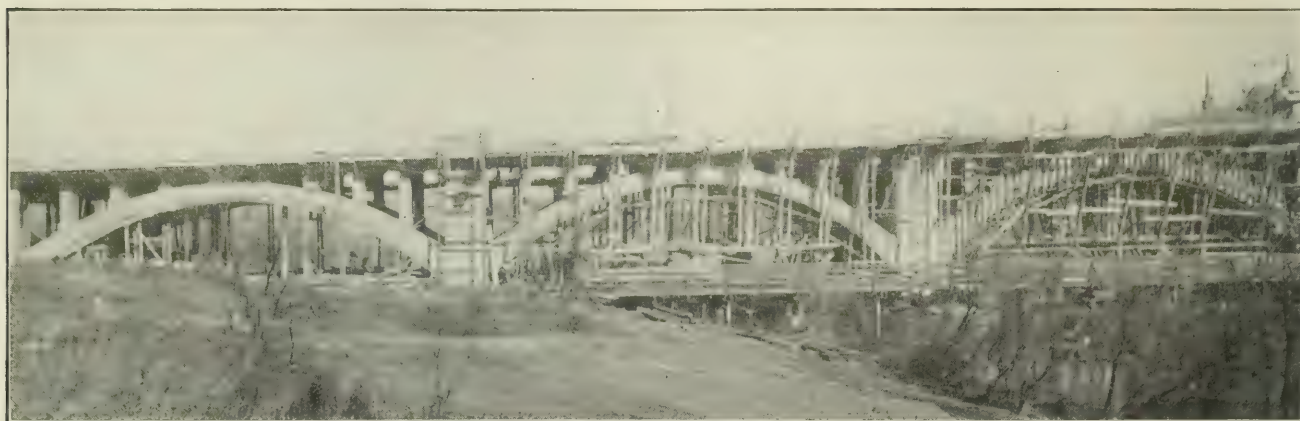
CONSTRUCTION OF MORGAN ST. REINFORCED-CONCRETE BRIDGE AT ROCKFORD, ILL.
